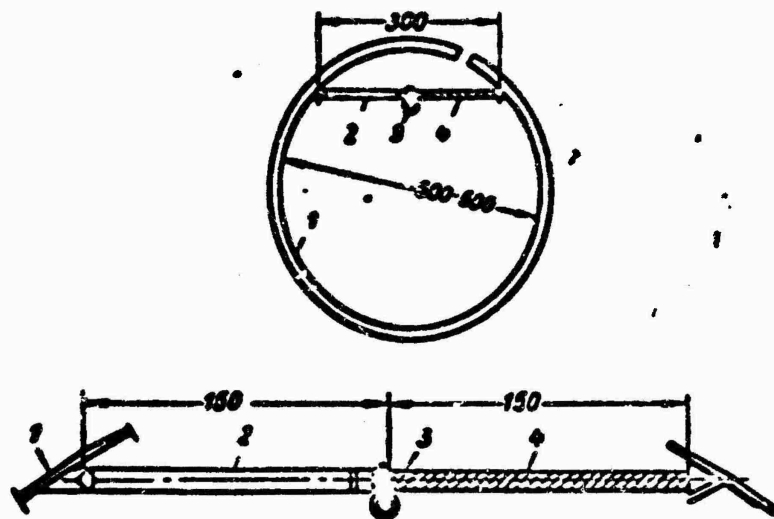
Bracing for insertion of joints between pipe links. 1) Slide-off hoop; 2) bracing (a pipe with $d = 22$ mm); 3) clamp; 4) removable rod.
